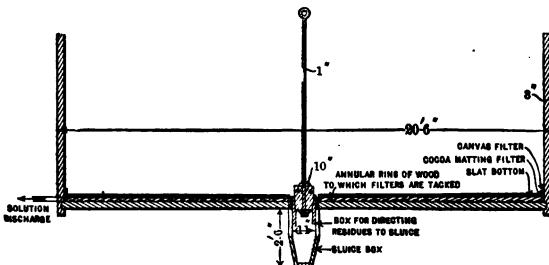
DETAILS OF FILTER BOTTOM AND BOTTOM-DISCHARGE DOOR.
